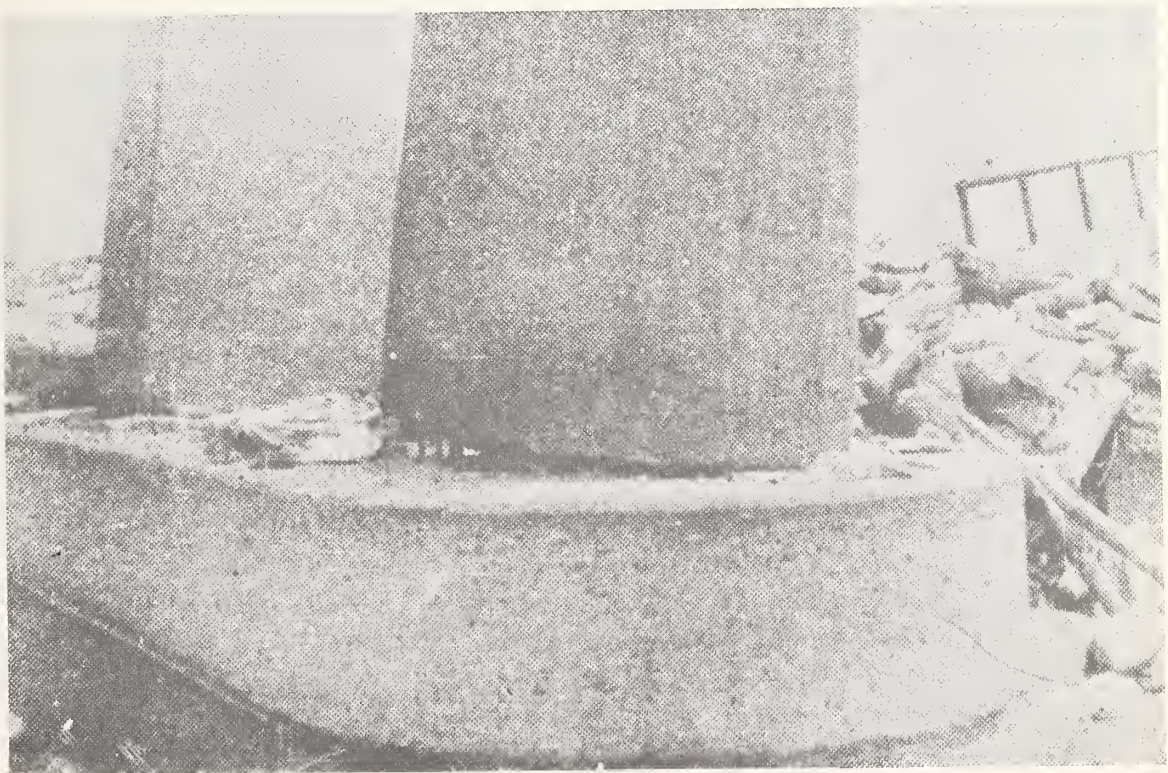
Damage to the Nakazuno bridge at the column-to-foundation connection.
